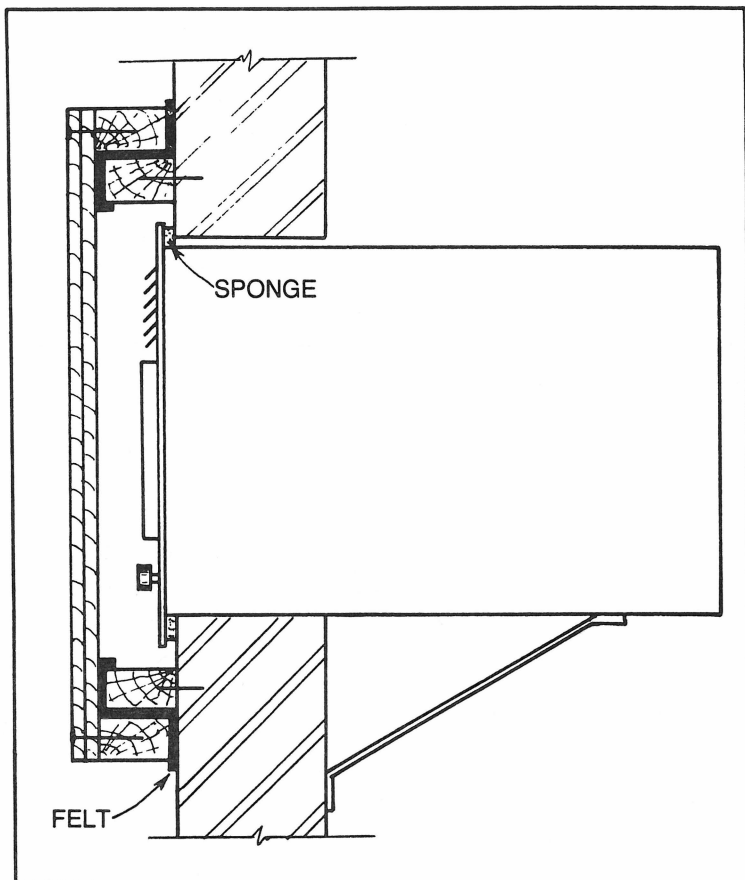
Room type air conditioners are not recommended for sound sensitive areas, but if they must be used, the above plan provides reasonable protection against intrusion of outside noise. The A/C unit is turned off and the door closed during actual recording.
